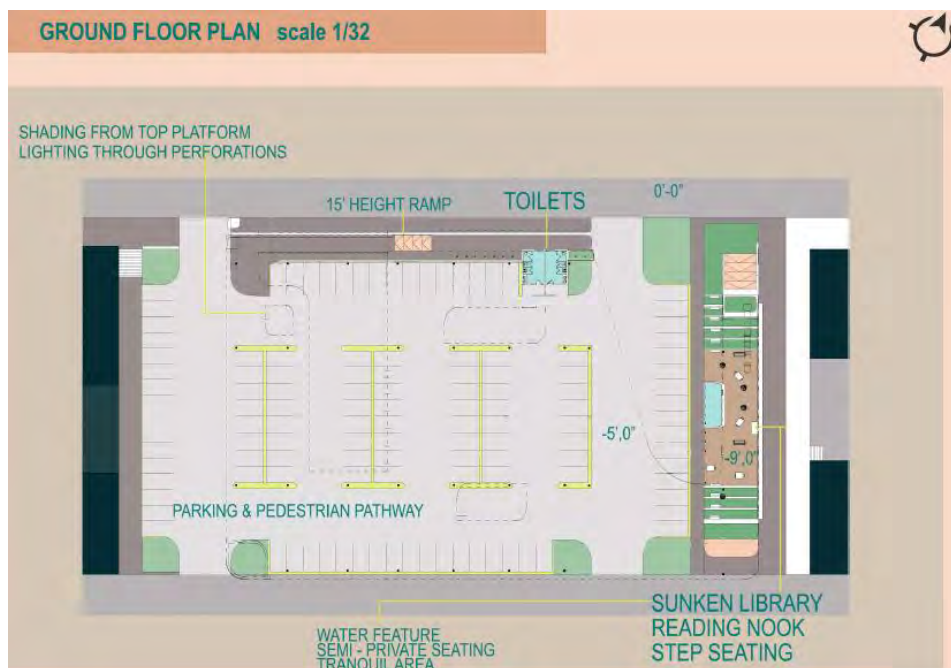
Proposal 01 – Ground Floor Plan (Source: Student group work.)
